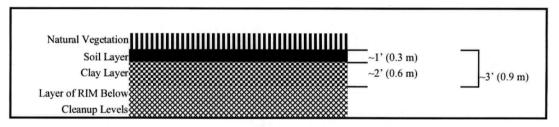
Stylized Cross-Section after RIM Has Been Excavated and Sent for Off-site Disposal "
